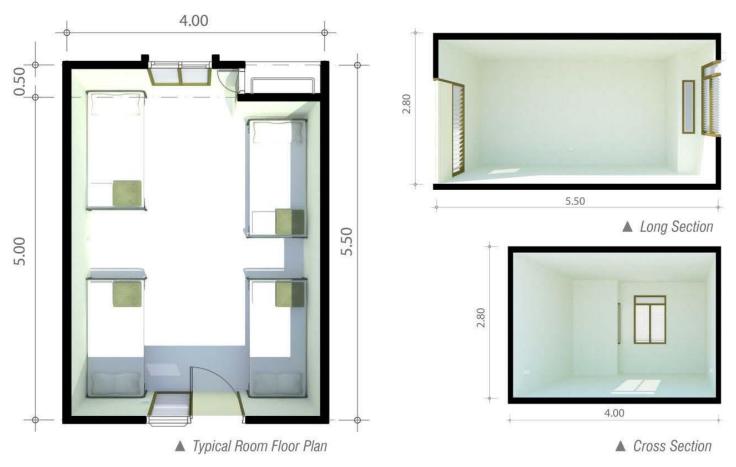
Floor plan and side views for room in 5-Floor workforce apartment
